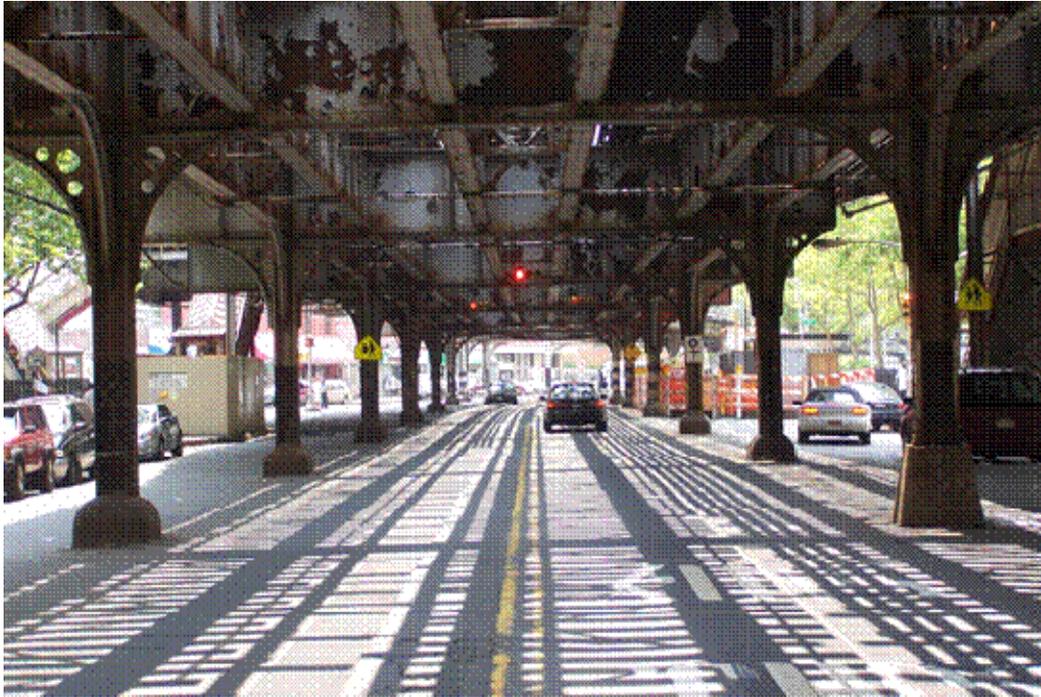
Looking west along Westchester Avenue toward Tinton Ave / East 156<sup>th</sup> St intersection
